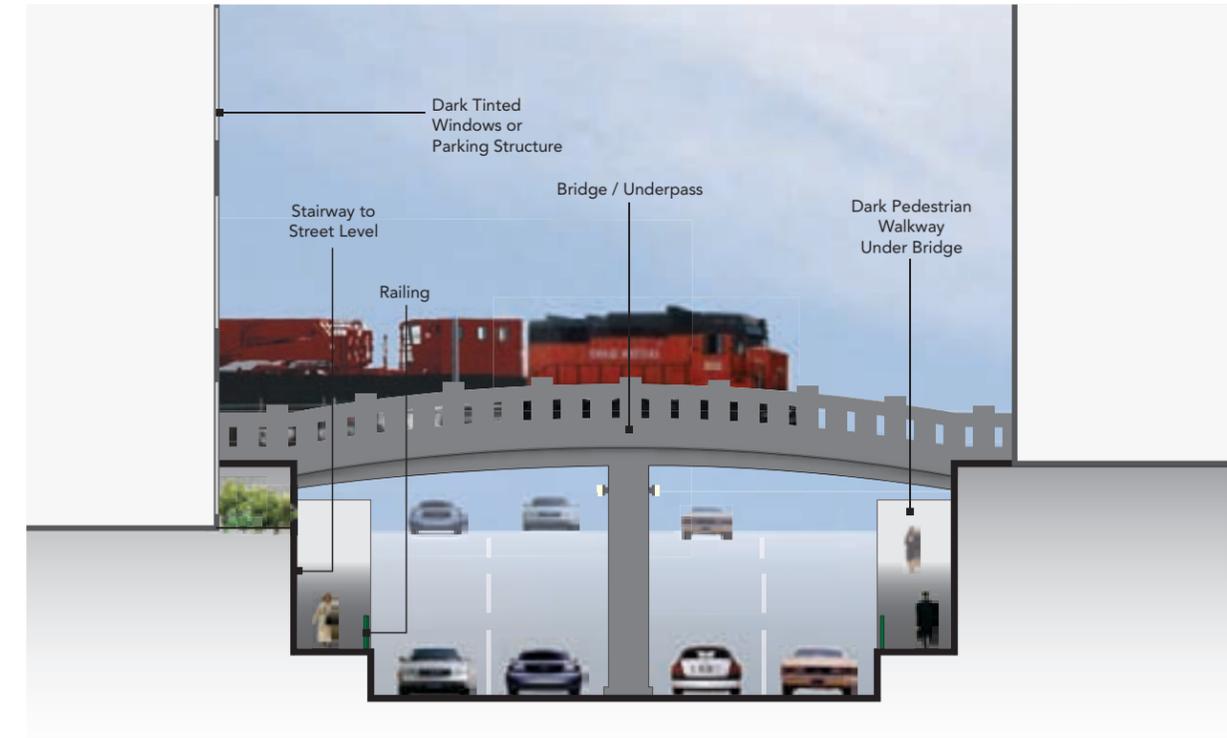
1: Section view of an existing underpass gateway to Downtown.
